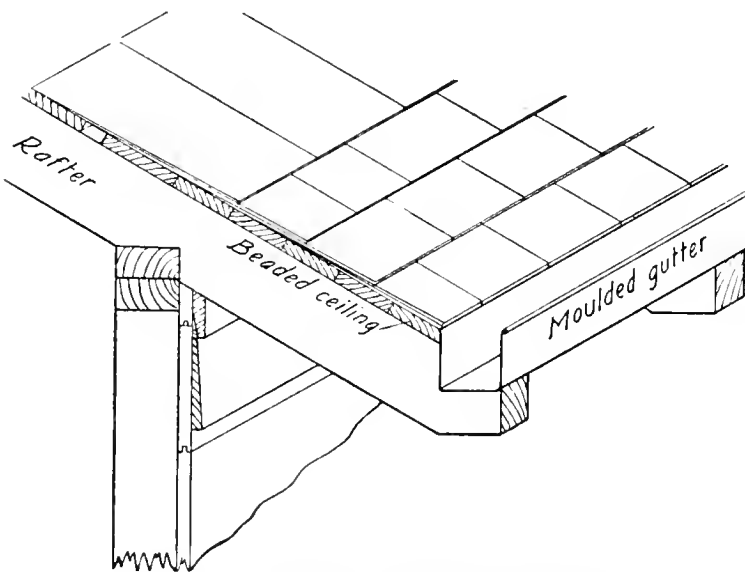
Typical open cornice, eave, and gutter (desirable)
